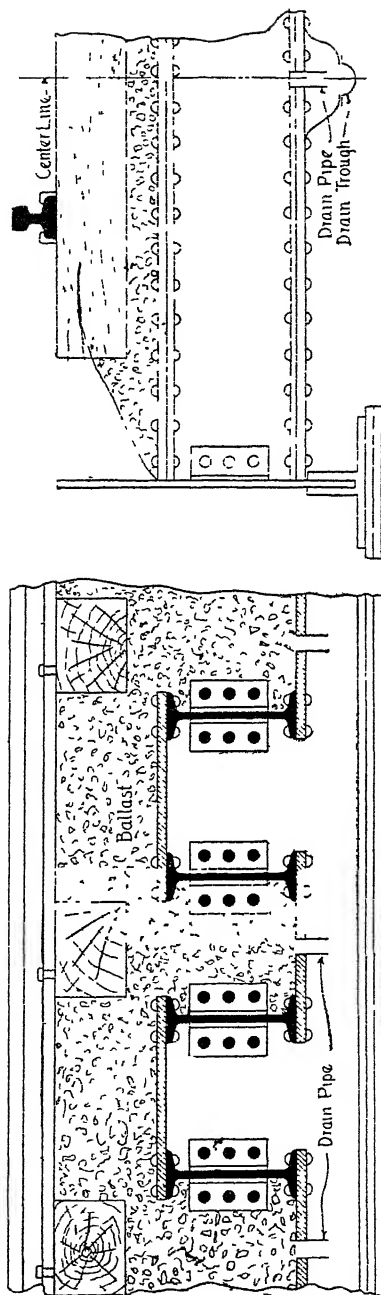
Longitudinal and Transverse Section of Solid-Floor Construction
